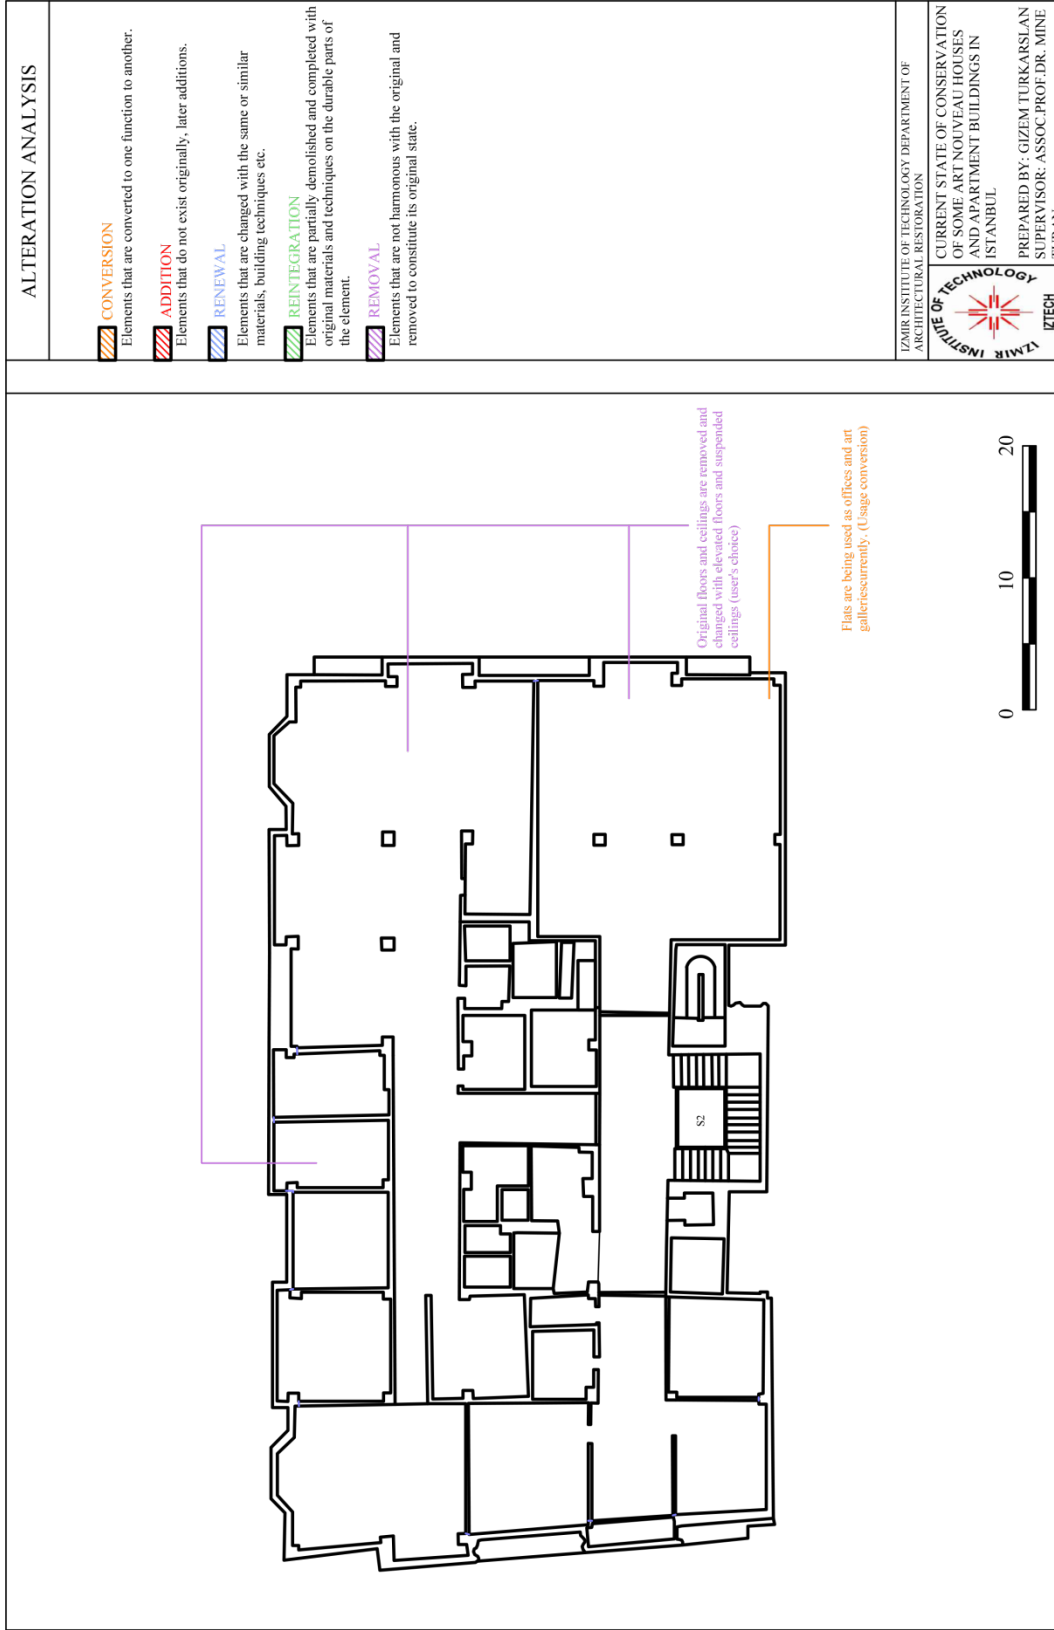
First Floor Plan, Alteration Analysis of Misir Apartment
